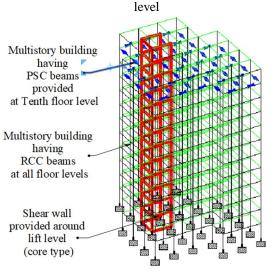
Model OPSC-BX - General Structure with PSC beam provided and interchanged at tenth floor level
